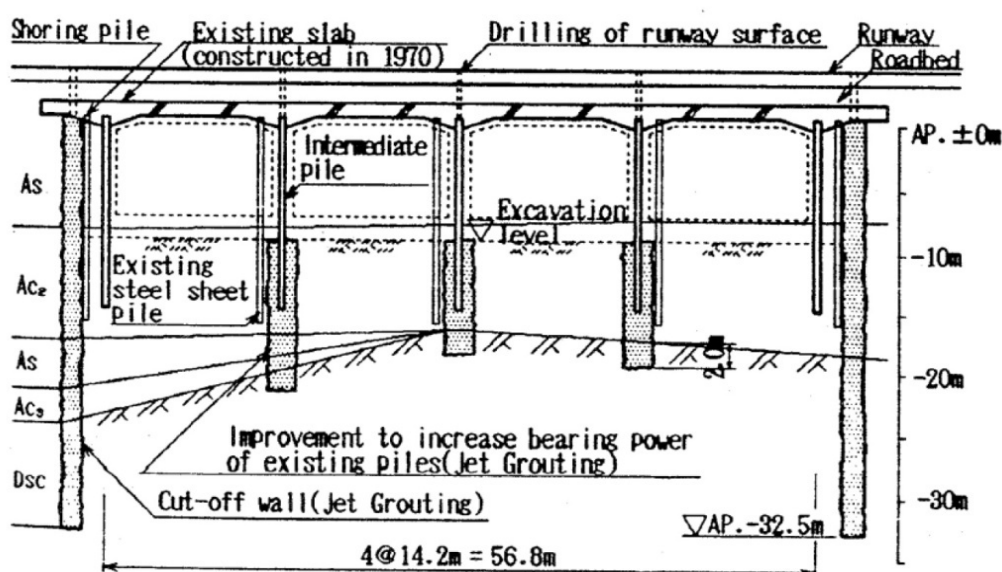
Excavation support seepage control by jet Grouting beneath existing airport runway
